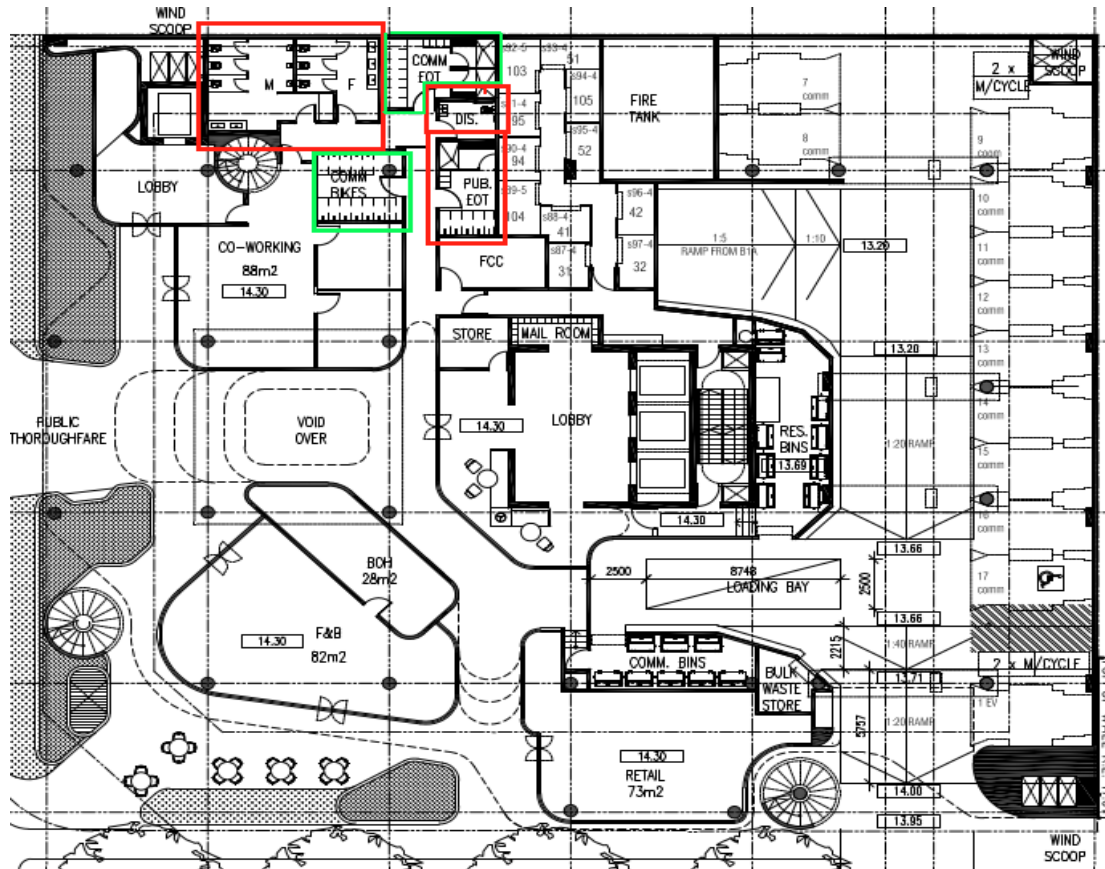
Current ground floor plan with public facilities comprising 3 male and 3 female toilets, 1 universal toilet and end of trip facilities comprising 1 shower, 3 lockers and 5 bicycle racks as marked in red, with the commercial end of trip facilities marked in green
